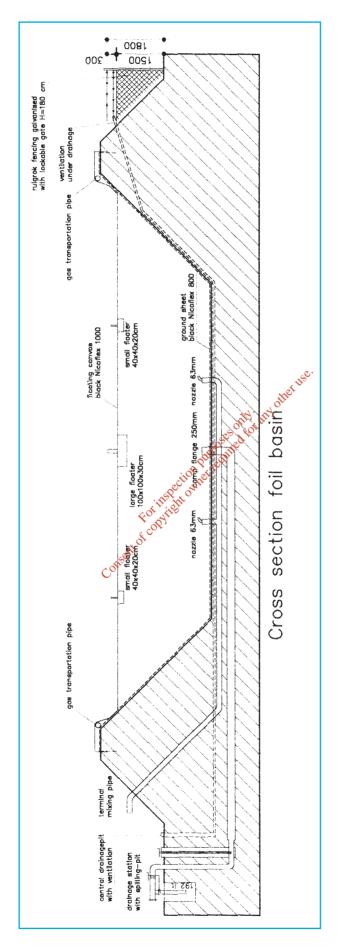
Fully enclosed slurry storage in earth shape with 1mm reinforced PVC lining (drawing courtesy of www.steenbergen.org)
